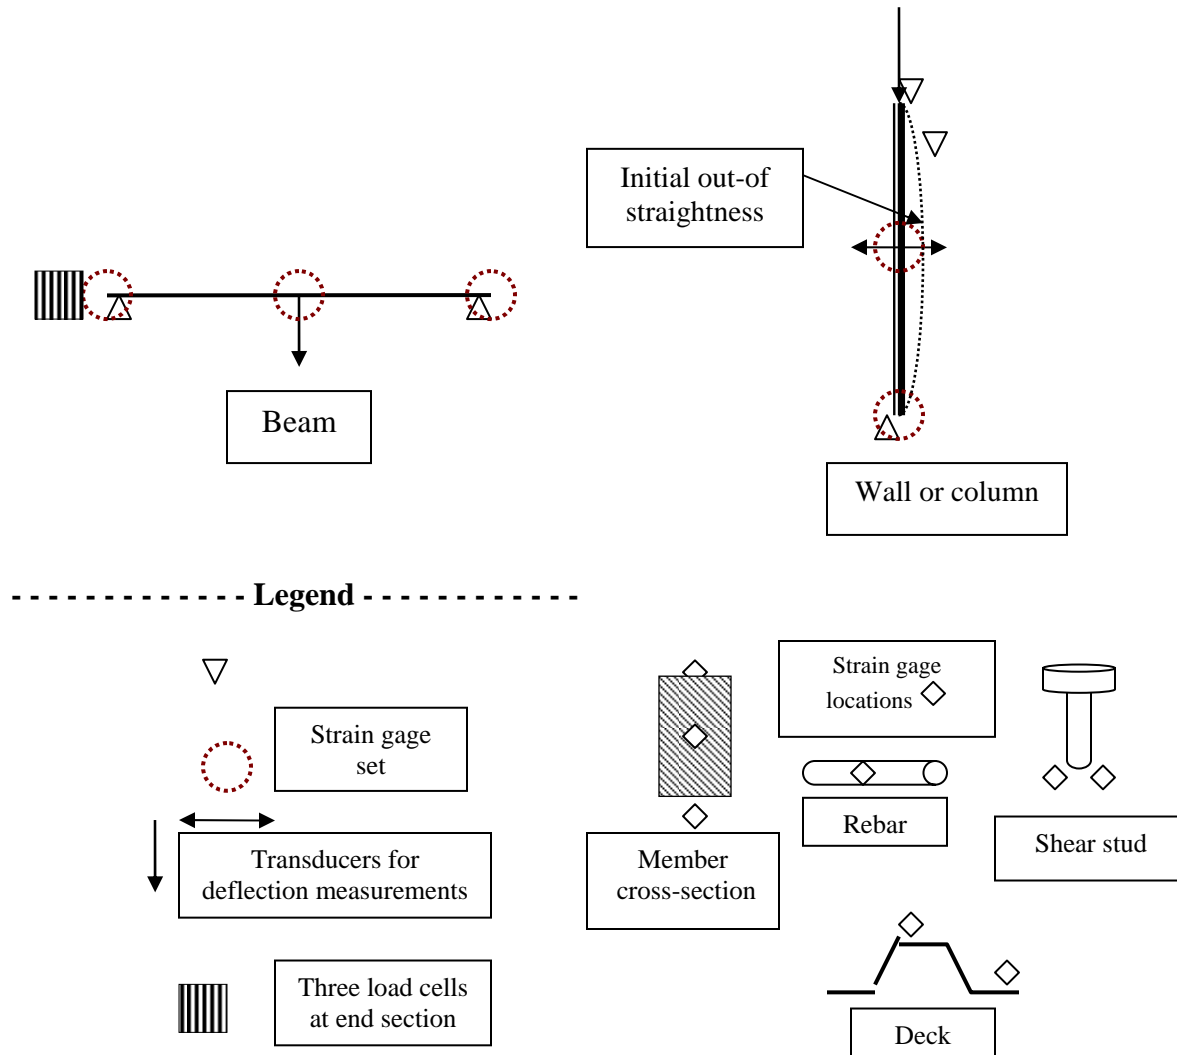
Illustration of recommended additional instrumentation for structural fire performance.
